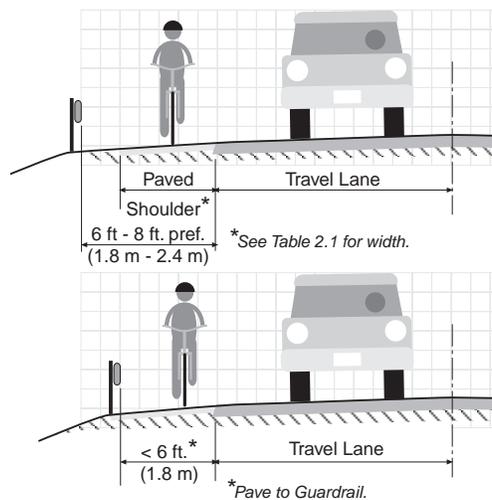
Guardrails should be offset from the travel lane by 6 ft to 8 ft (1.8 m - 2.4 m). The width of the paved shoulder should be determined by consulting Table 2.1.
